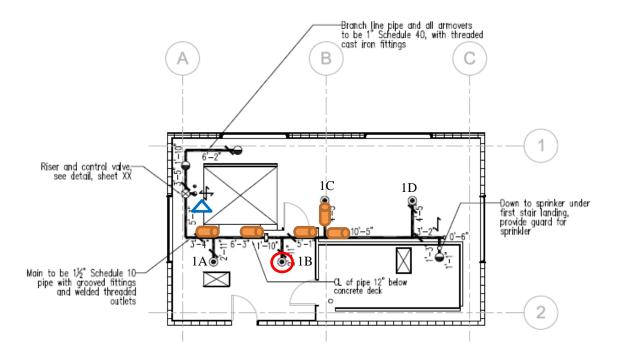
Floor 1 sprinkler system design layout and specifications
